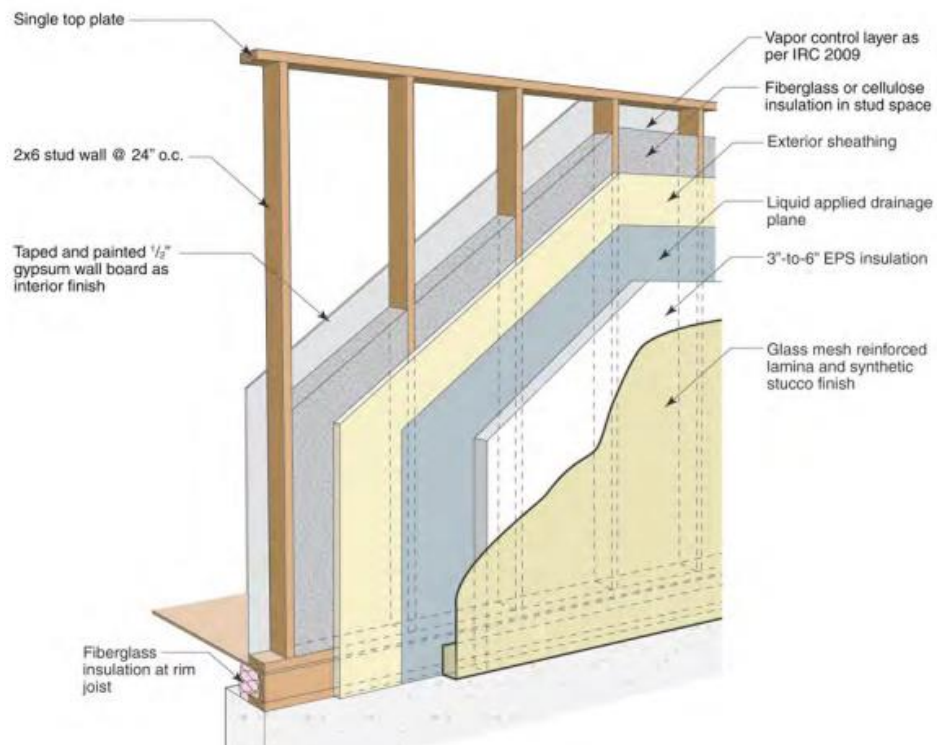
EIFS Wall System (Straube and Smegal, 2009)
